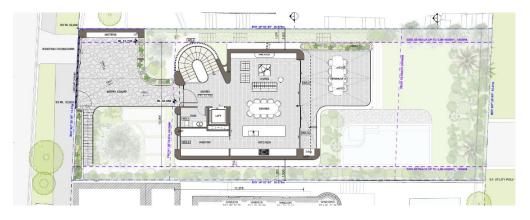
Proposed lower ground floor plan (Source: MHNDUnion)
